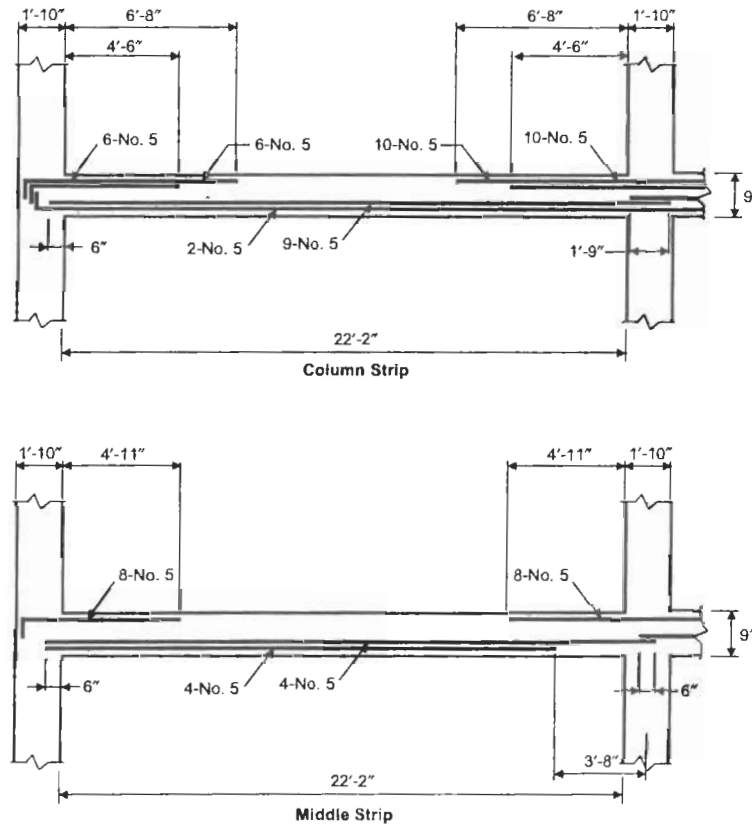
Reinforcement Details for Interior Design Strip, Floor Level 4 (SDC A)
